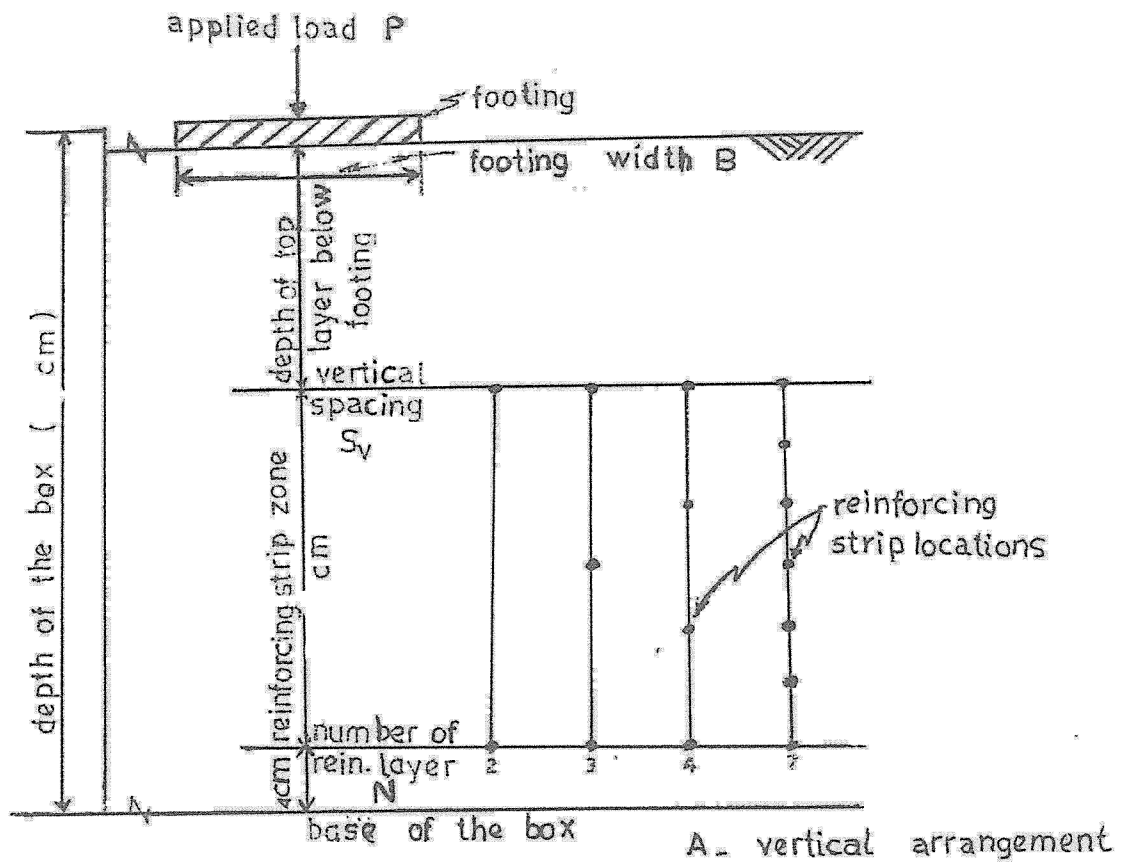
LAYOUT OF REINFORCING STRIP LOCATIONS
